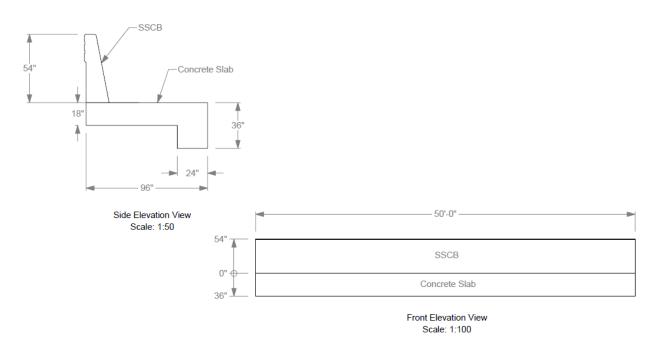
Concept 6 – Moment Slab with Concrete Beam Design.
